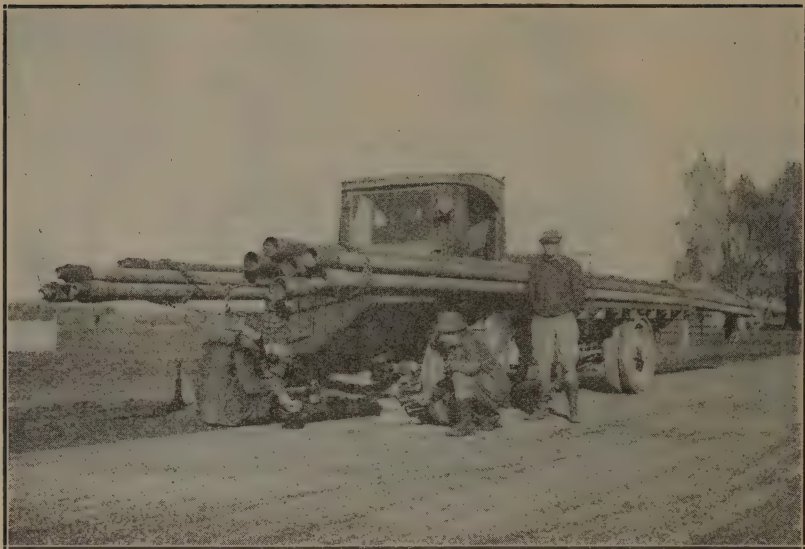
Plate XLIV. State Highway, heavily loaded truck being weighed with loadometers.
